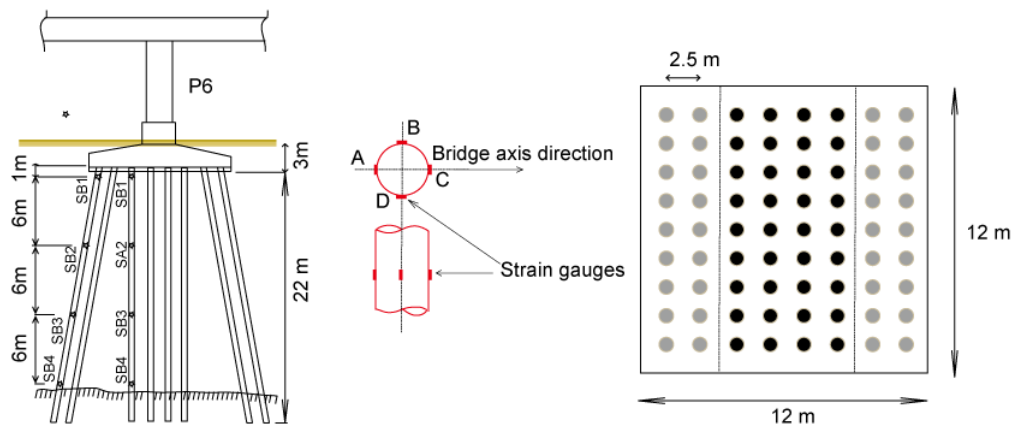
Cross section of Pier 6 of Ohba-Ohashi bridge (modified after Ohira et al. [18])
